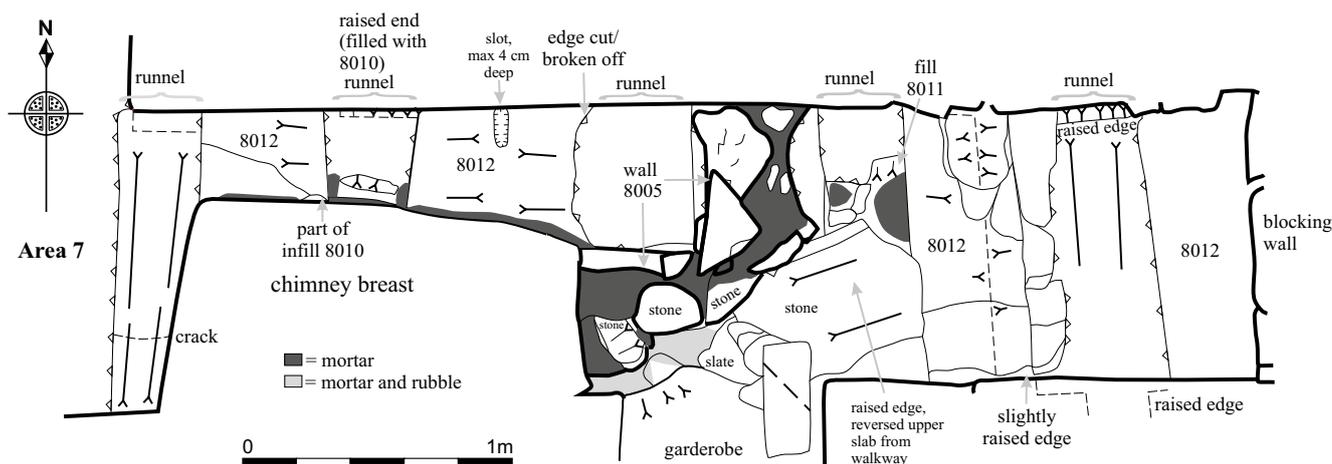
Area 8 floor slabs (8012) and wall (8005)
